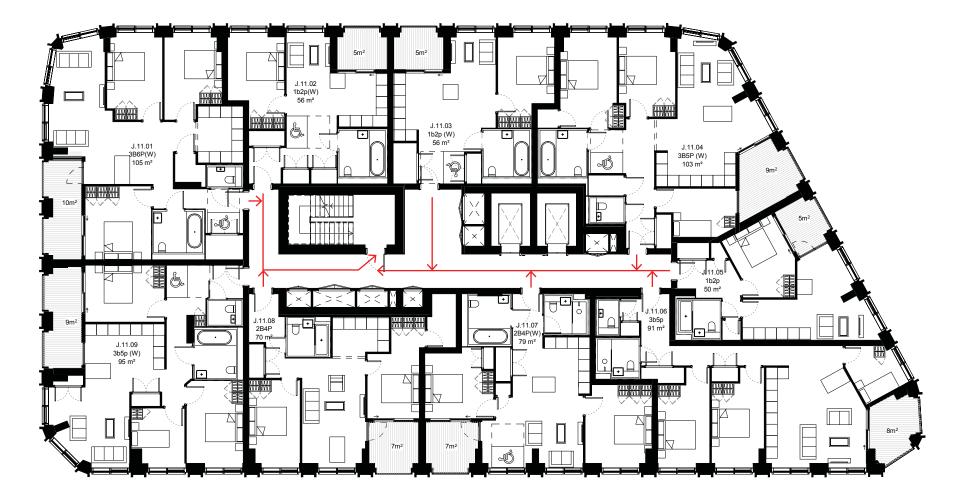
Block J - Typical Floor - Fire Escape Routes
